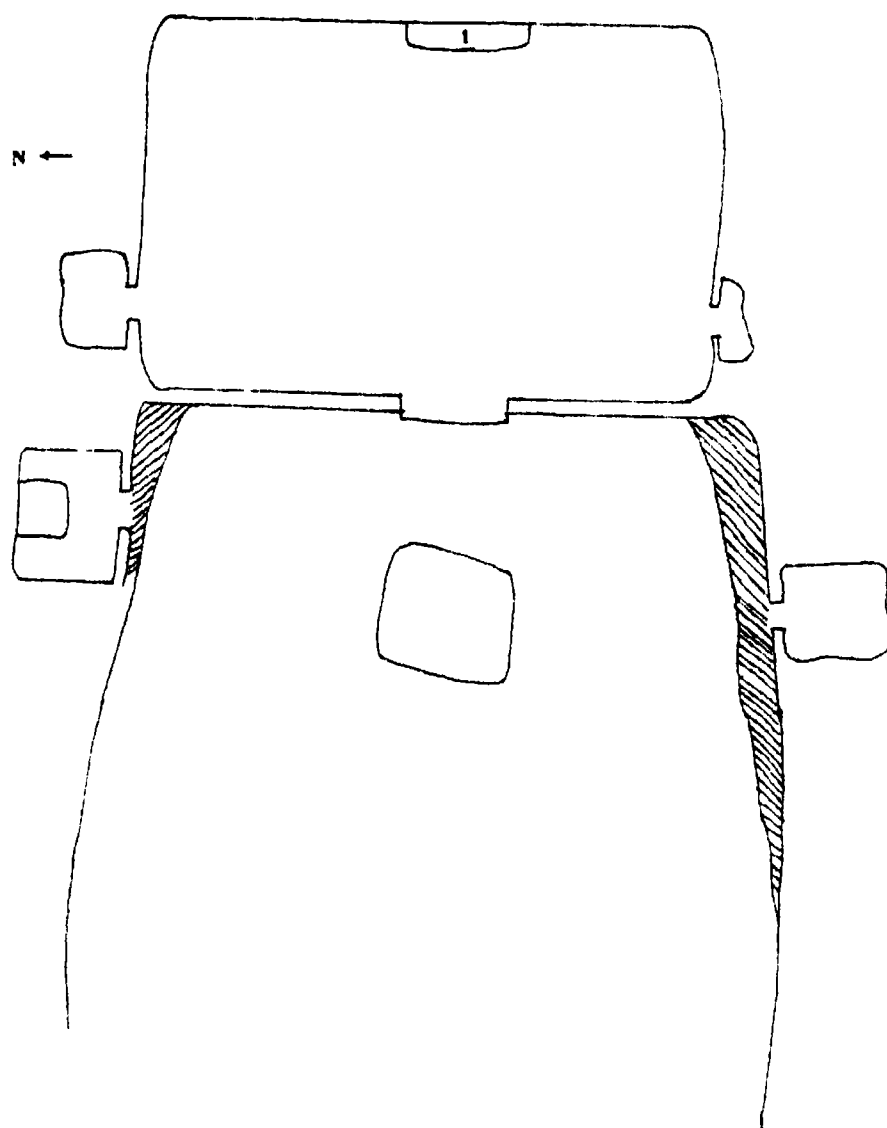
Ground plan, pillars & shrine doorway of cave at Ambejogai
